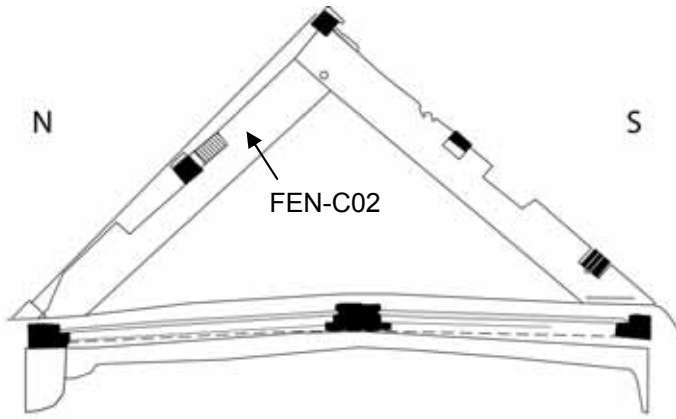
Truss 1, showing the location of sample FEN-C02 (based on Truss 4 provided by John Allen)
